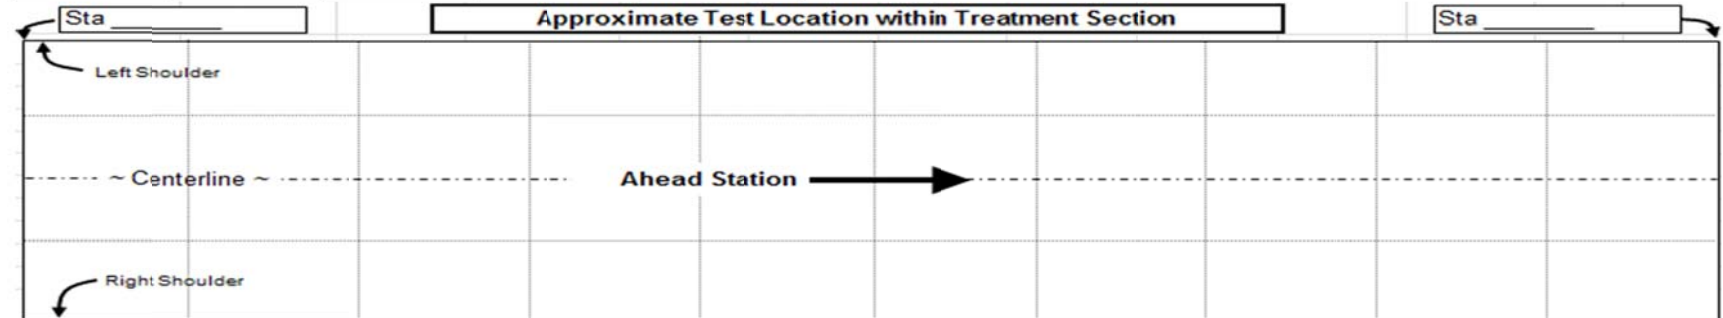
Inspector Worksheet ~ Road Prep, Cement Spread
